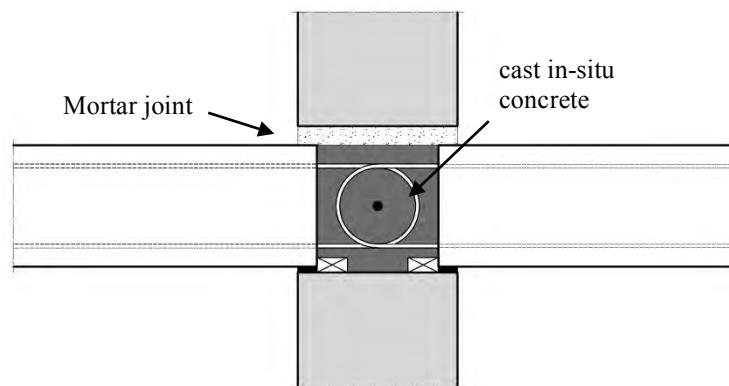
Tensile joint by lapping reinforcement combined with dowel action
